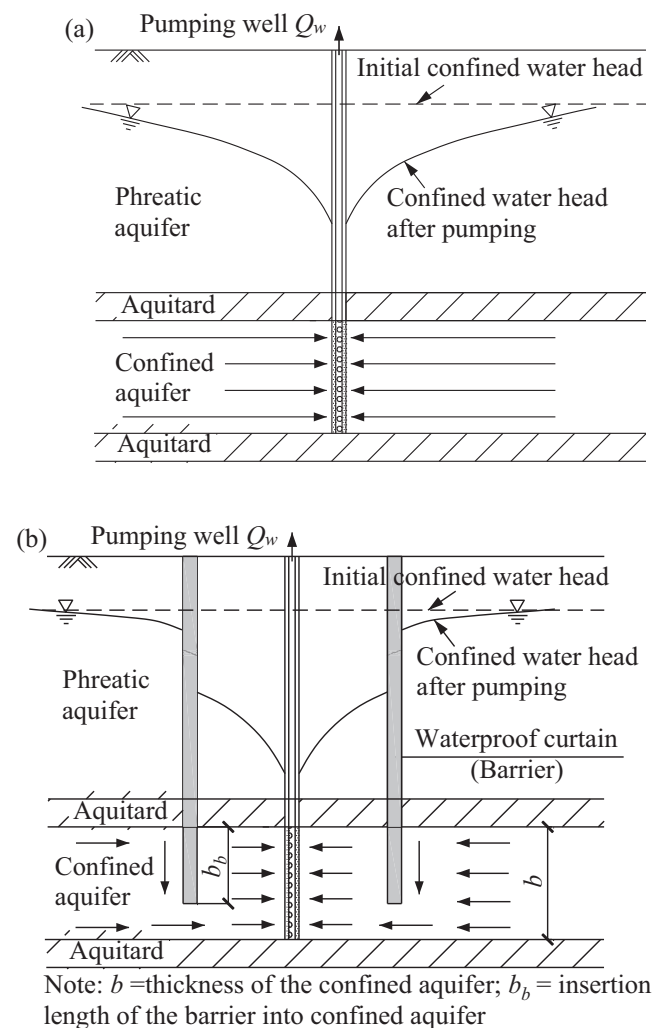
Cross-section view of groundwater head and fully penetrated pumping well in confined aquifer: (a) without barrier, (b) with barrier.
